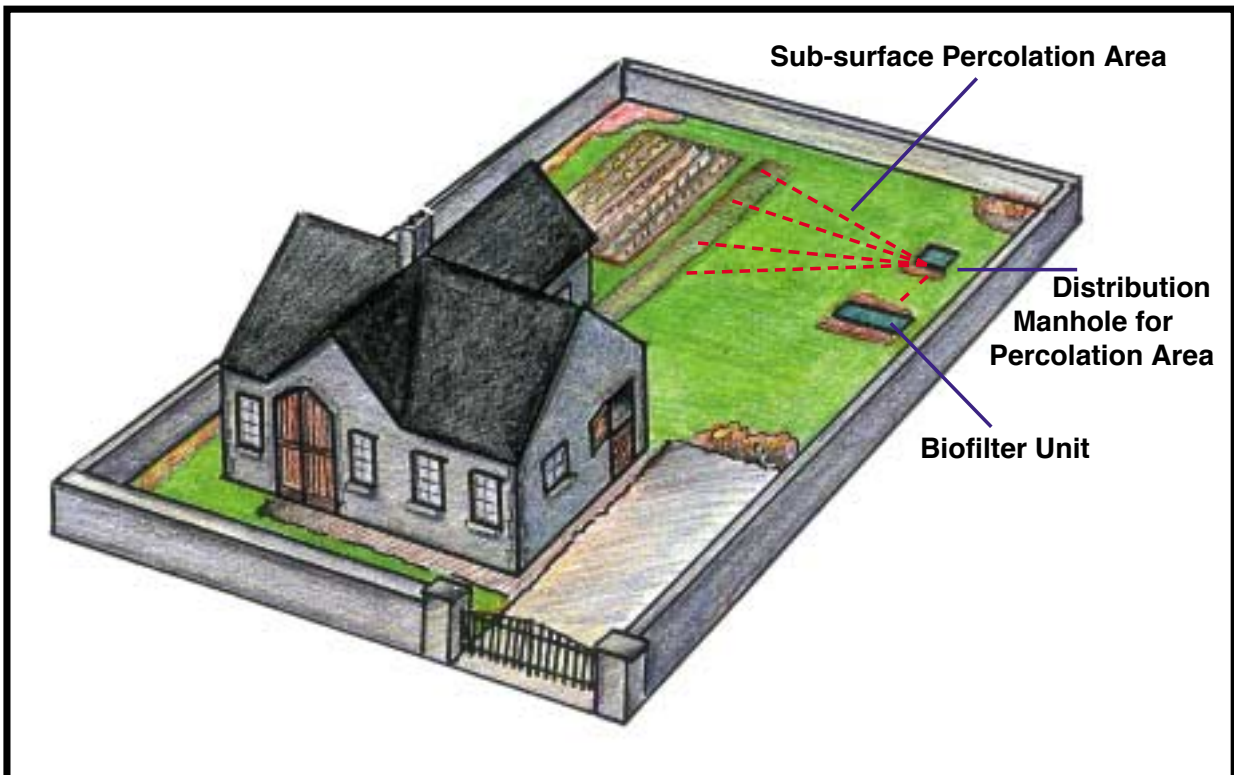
Typical layout of Biofilter Unit & Sub-surface Percolation Area
